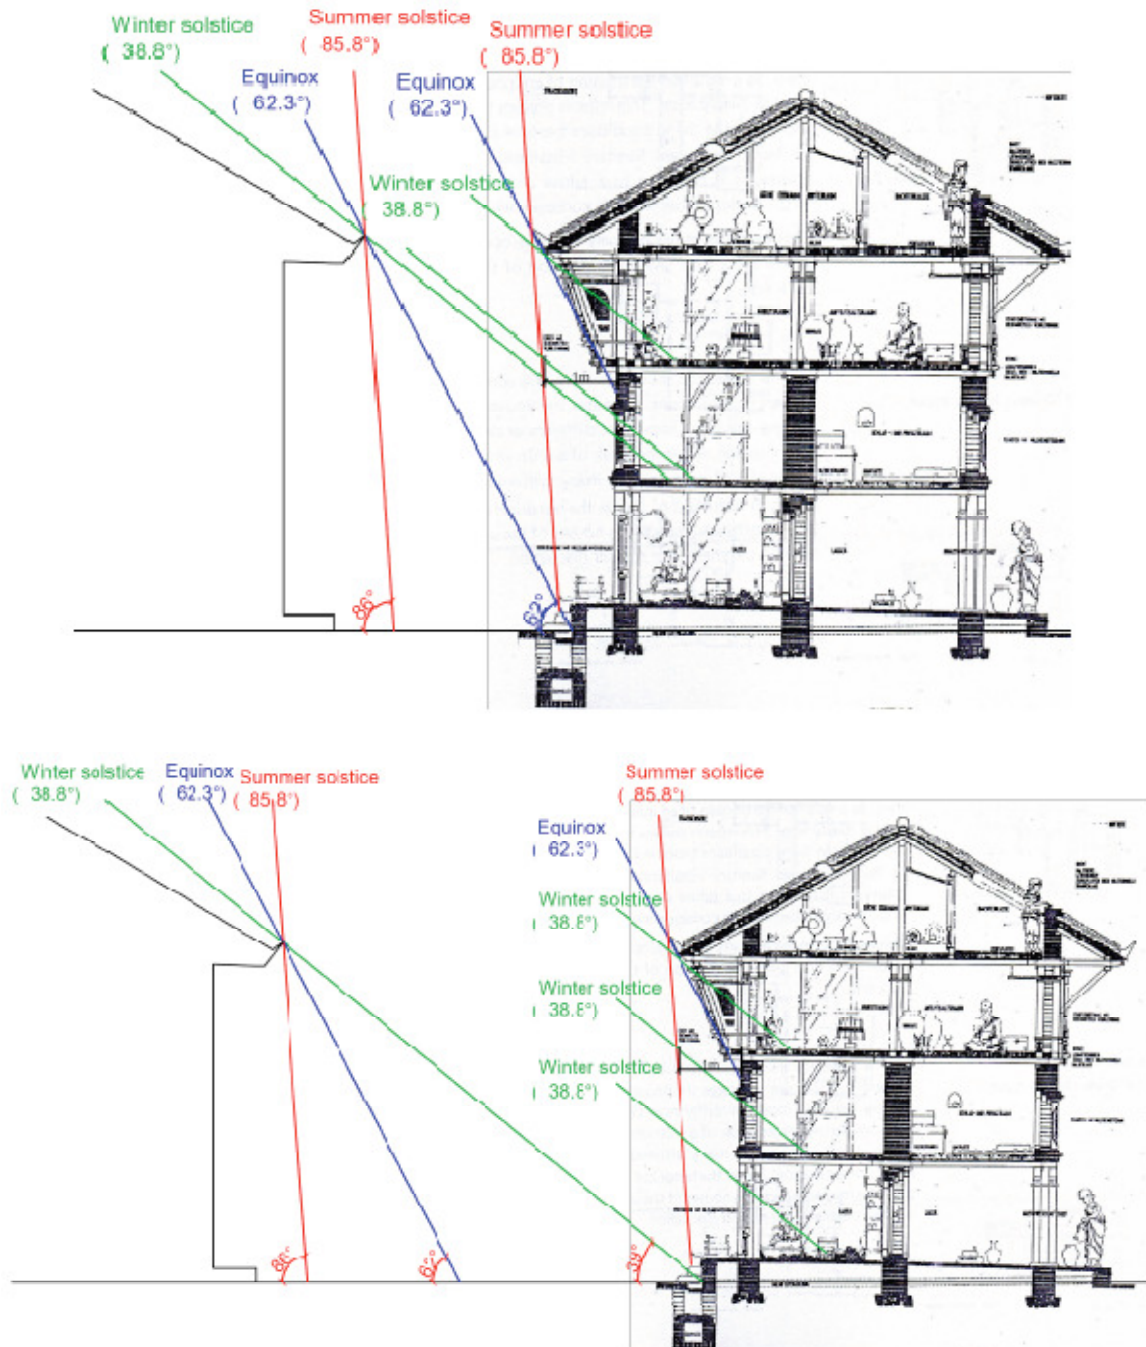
Wide and narrow street allowing solar radiation from ground floor and first floor respectively
